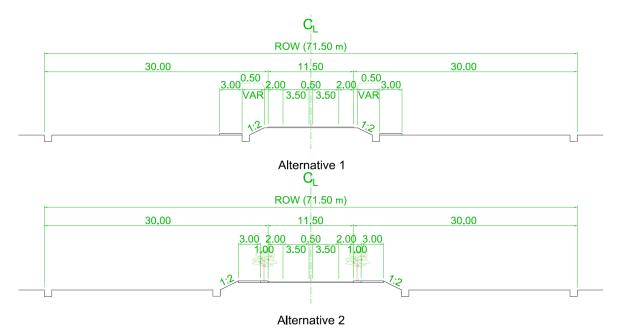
Typical Cross Sections for Cuamba Bypass Road
